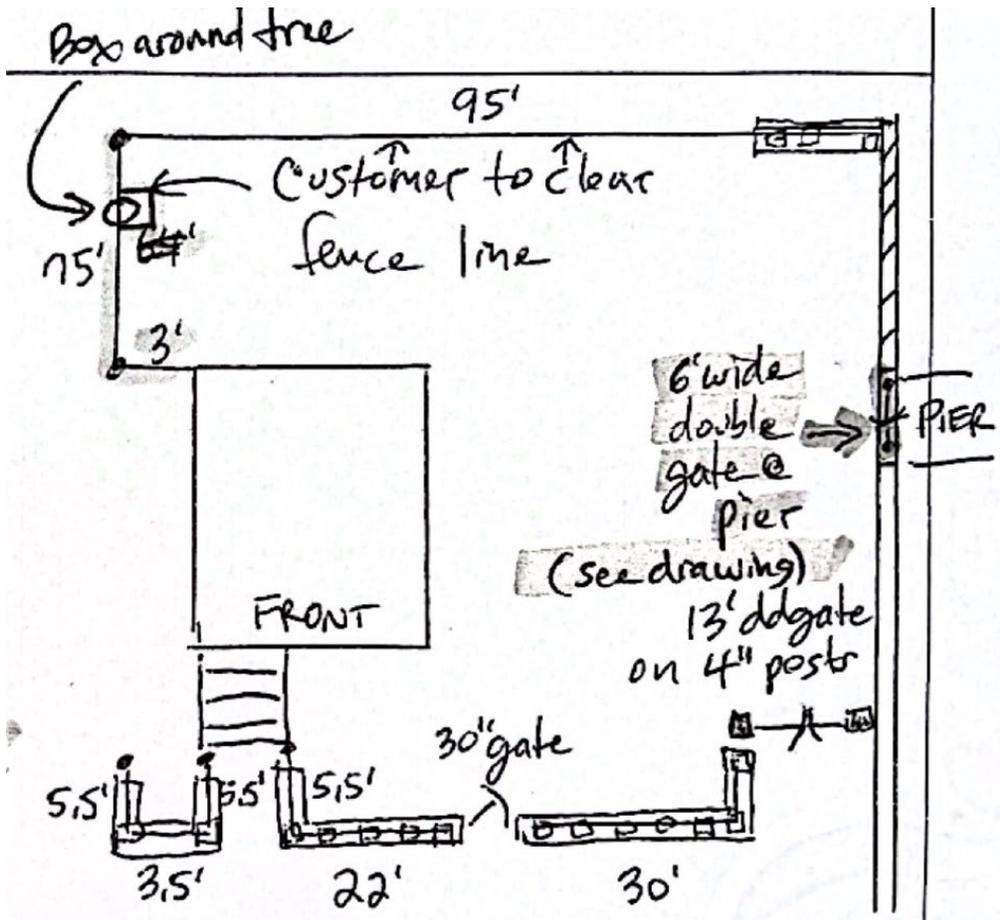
Layout of new fence and gate work. (image provided by Applicant's fence contractor)
